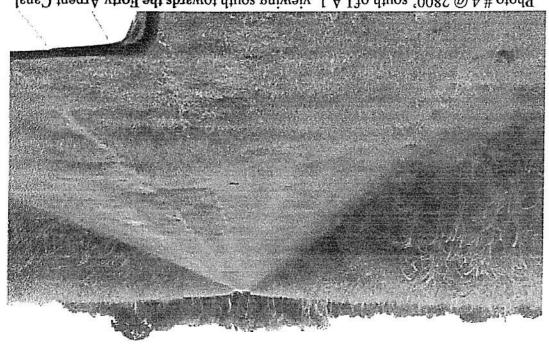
@ 2800' south of L.A. I, viewing south towards the Forty Arpent Canal
